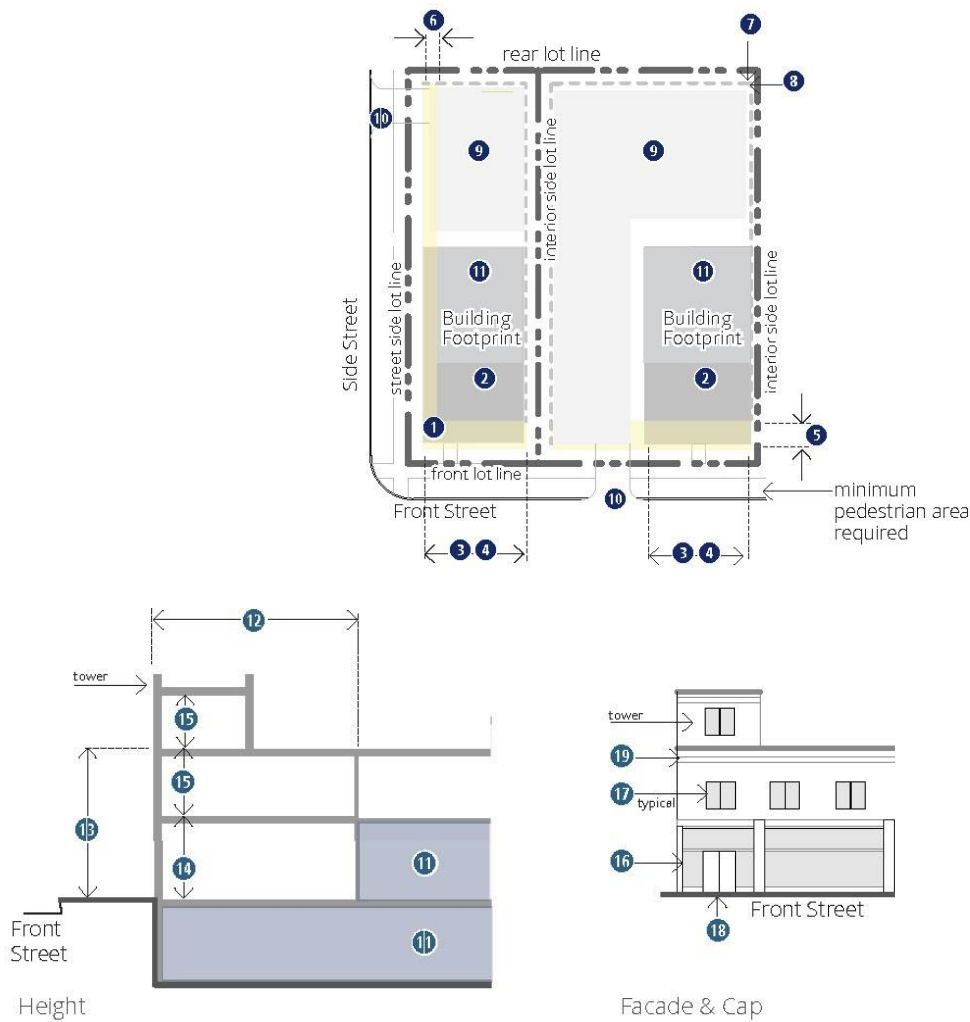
(4). NMU district diagrammatic plans and elevations.
